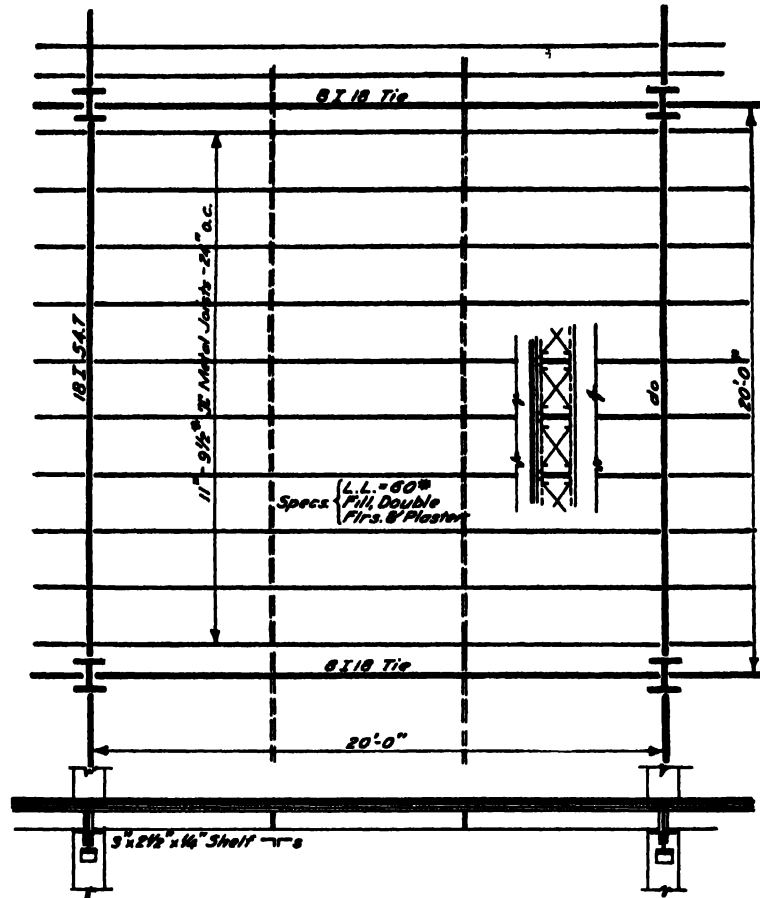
TYPICAL STEEL JOIST FRAMING PLAN
